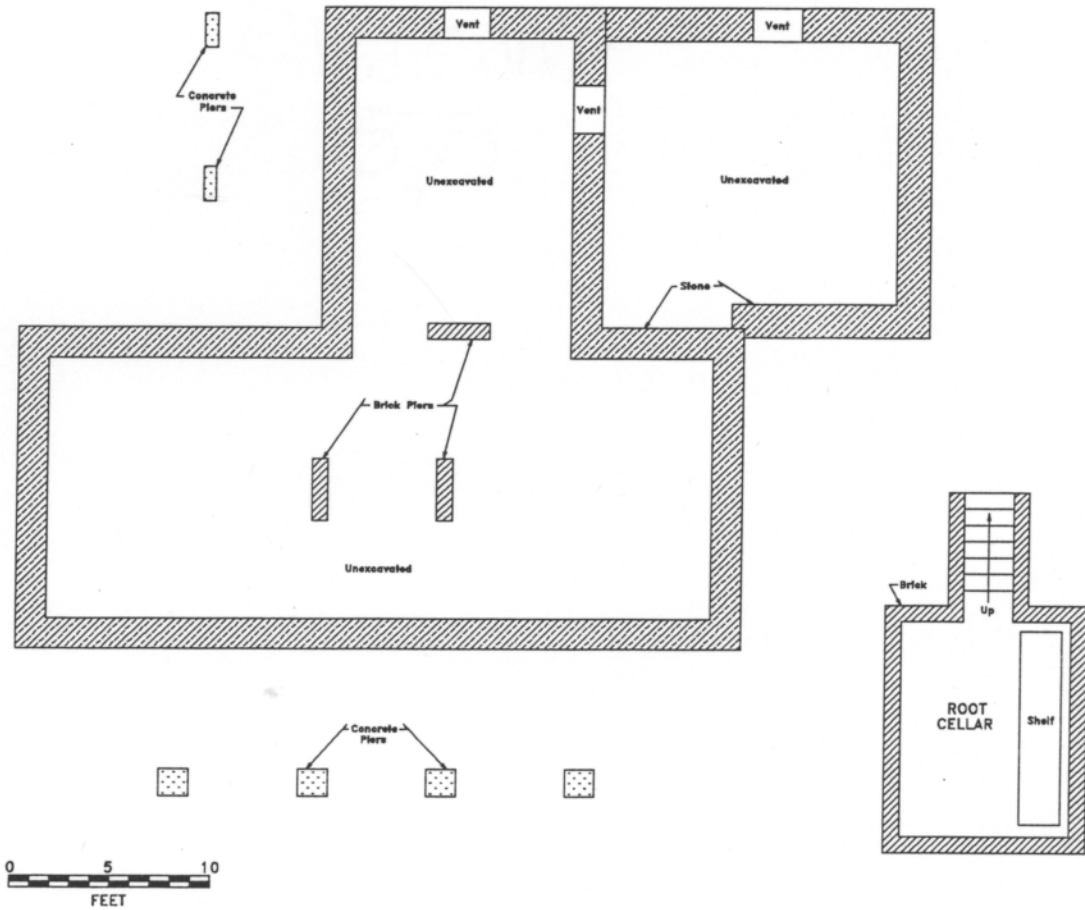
Basement and foundation plan of the Williamson House, 1995.
